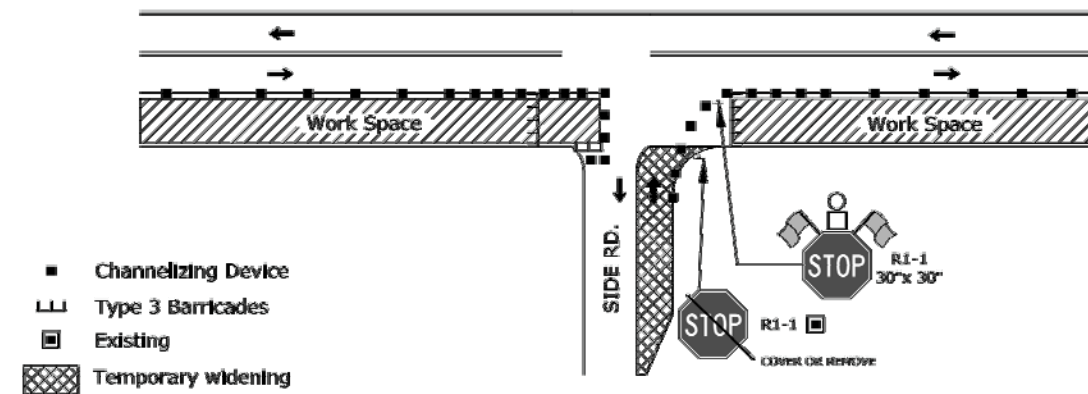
SIDE ROAD OR ENTRANCE CONSTRUCTED HALF AT A TIME:
